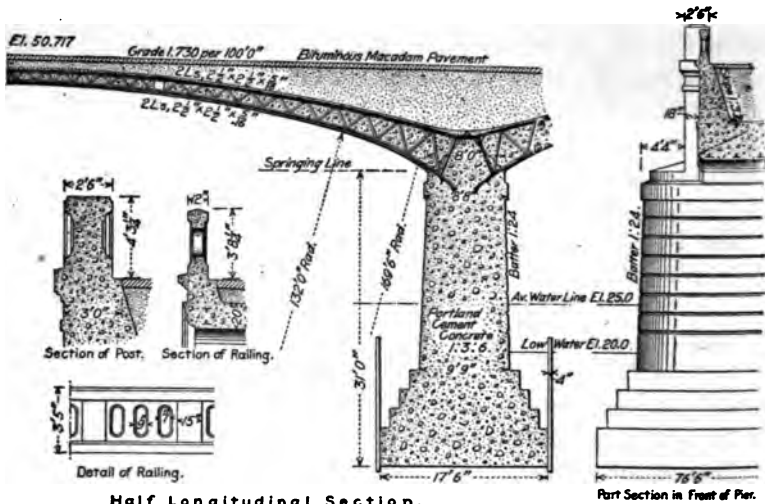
Details of Melan Arch Bridge at Dayton, O.
